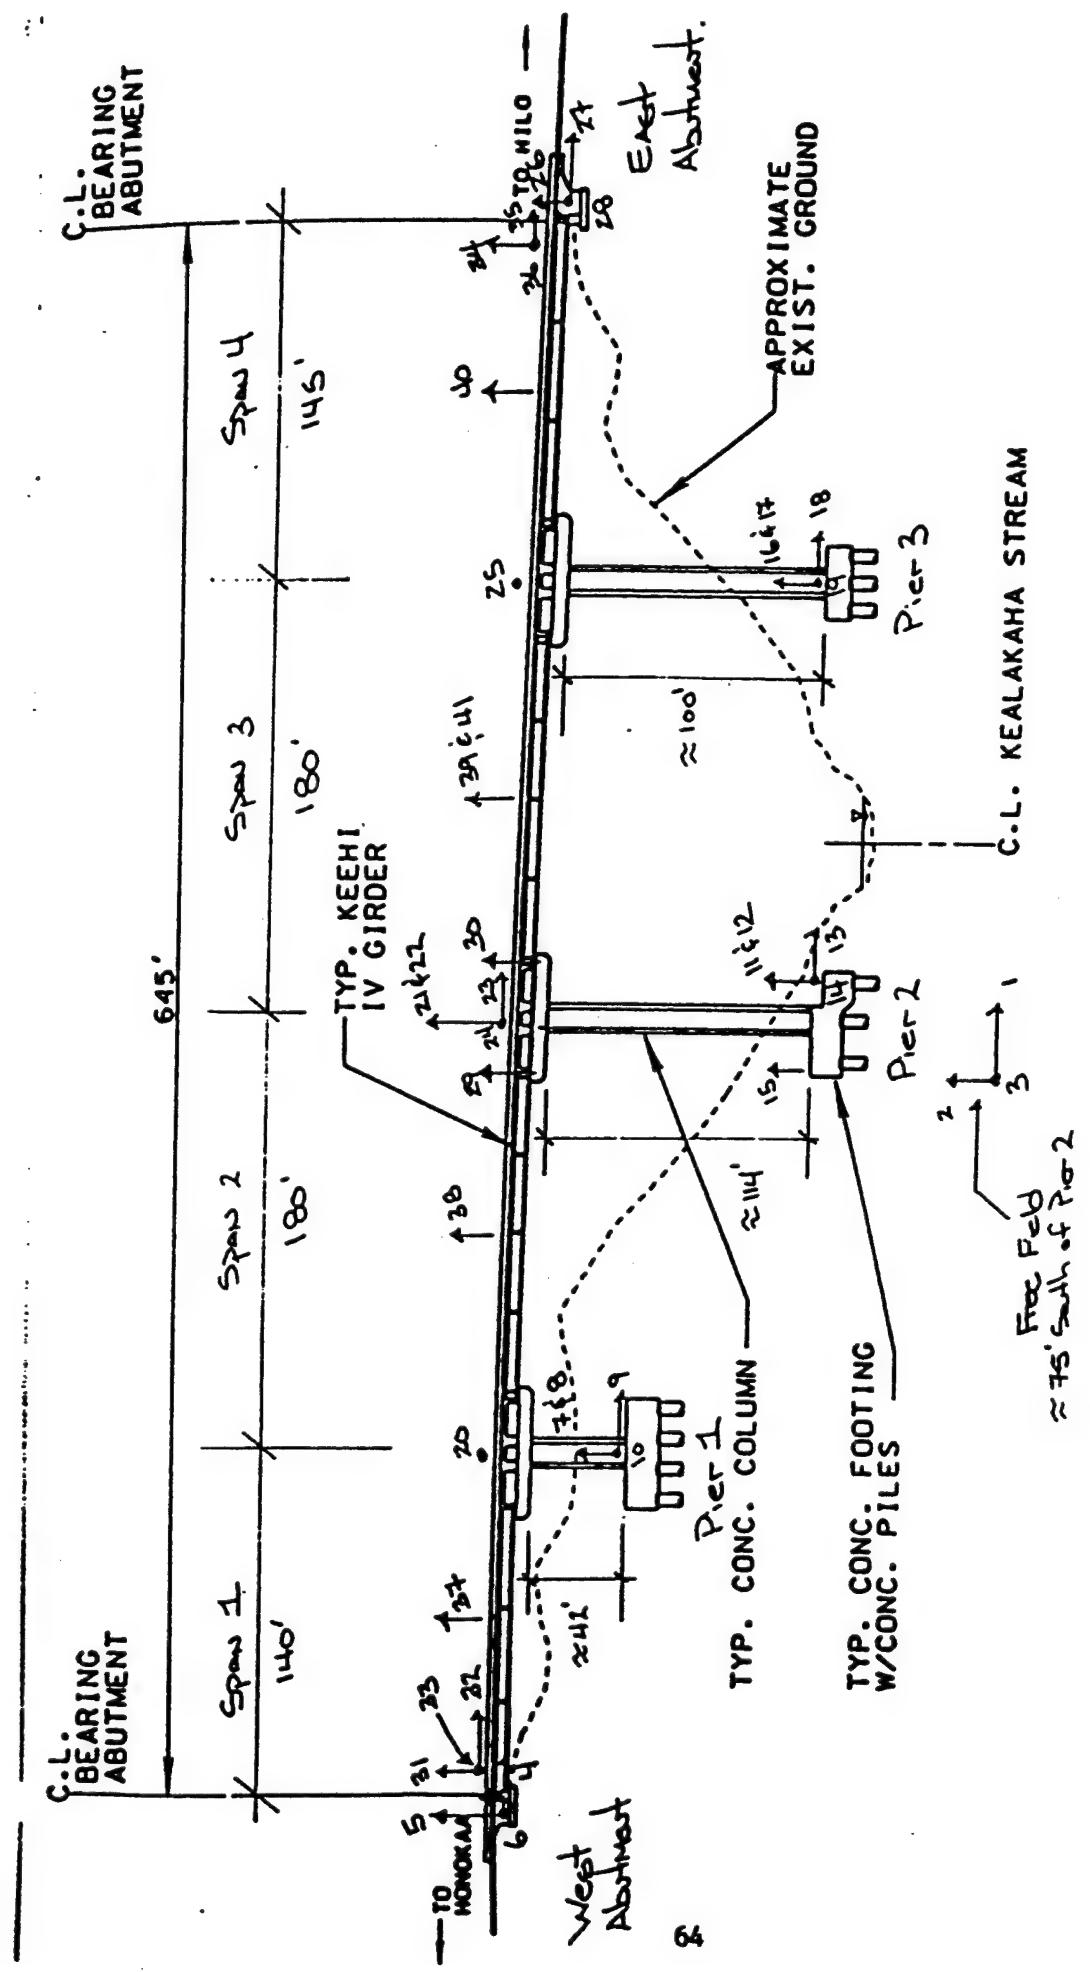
Kealakaha Bridge Seismic Instrument Locations (Elevation View).
